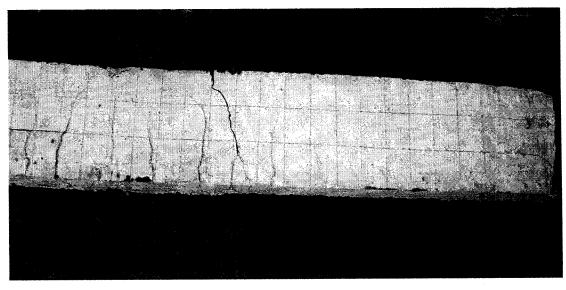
Crack pattern of beam without web reinforcement (WOWR2)
